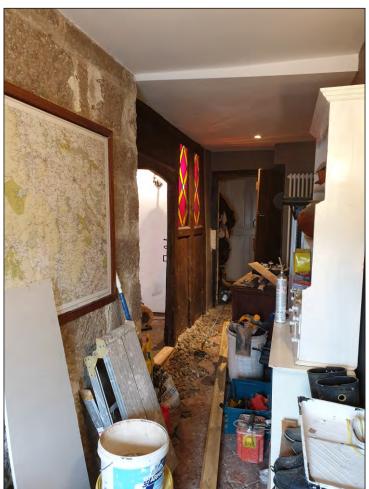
East elevation of Bell House showing rear of crown strut partition defining the first floor chamber.
